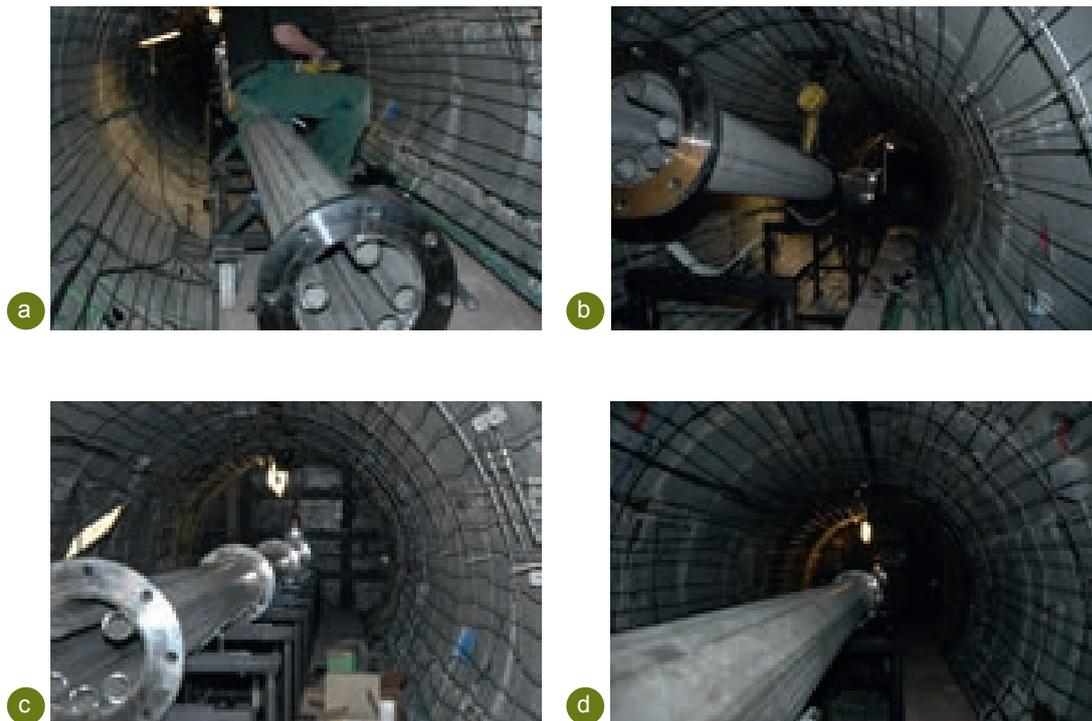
Assembly of the central tube sections (a) the tube section is transported through the gallery on a wagon to its assembly position; (b) the tube section is hoisted and a support structure is built below the hoisted tube section; (c) the tube section is lowered onto the support structure and its upstream end is bolted to the previously installed tube section; (d) the downstream end of the tube section is positioned using a laser.
